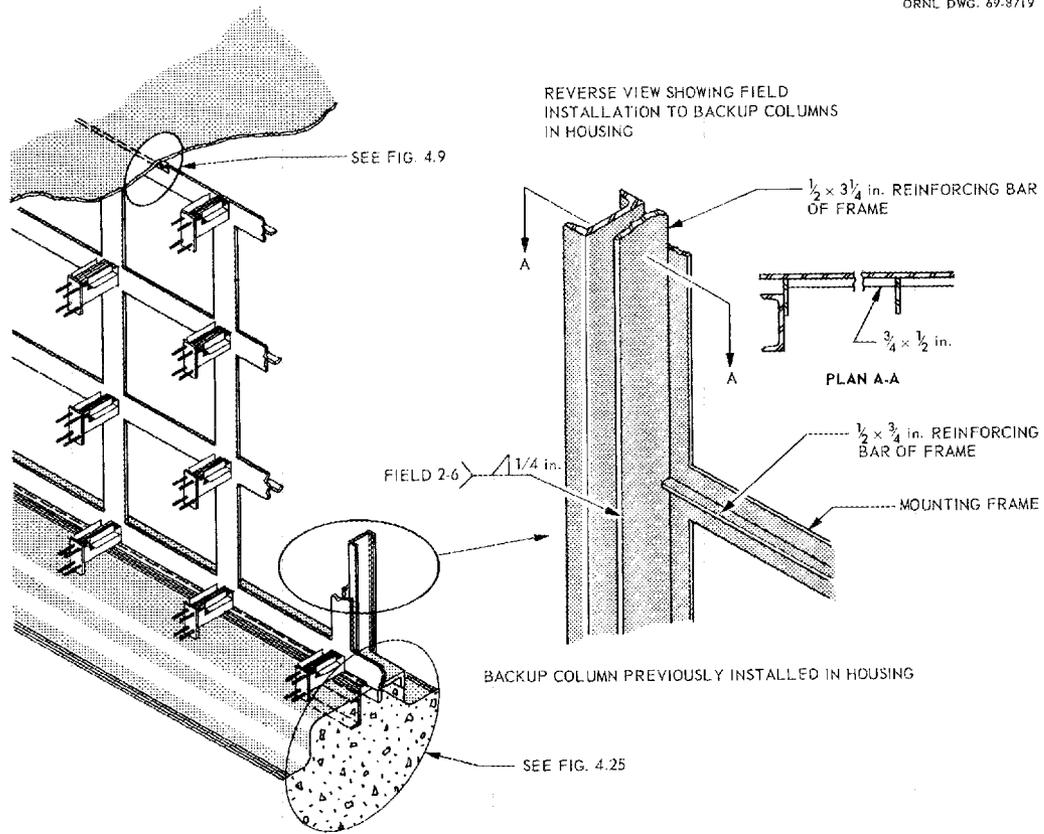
Mounting frame for HEPA filters and adsorbers made from a single plate, showing installation to previously installed backup columns in filter house. See Figs. 4.8, 4.9, and 4.10.
